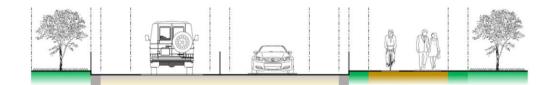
CFAF Outcome - Upgrade to Dairy Flat Highway (Durey Road to Albany Village) indicative 19.1 m cross section
